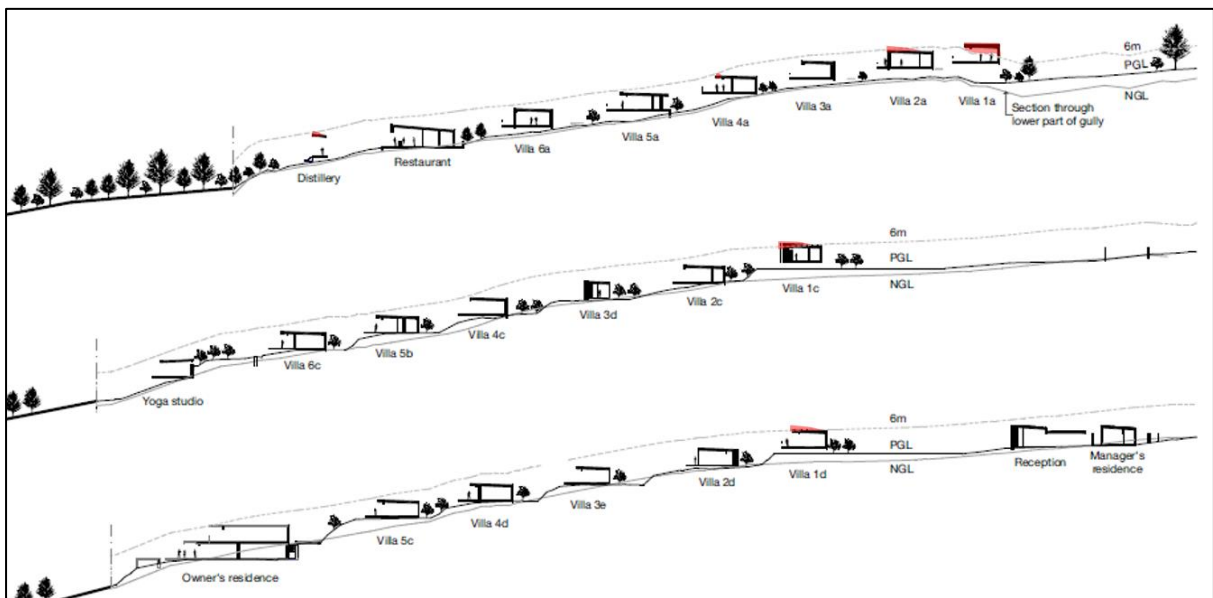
Proposed Sections with height plane breaches of buildings set out in Table 4 highlighted in red. Image Source: Design Base Architecture.
